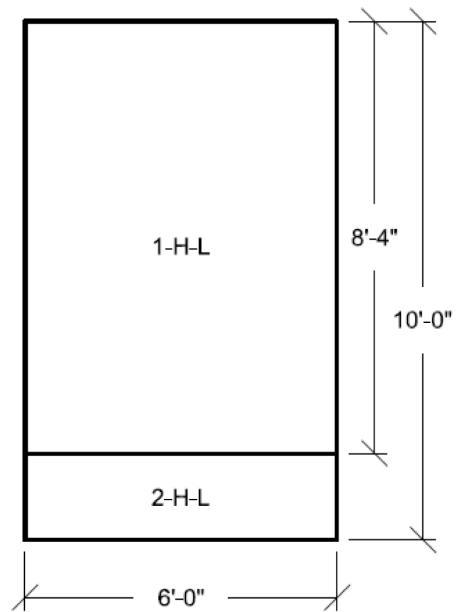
H.6-156 DGFOSV Roof 5 Looking Down
